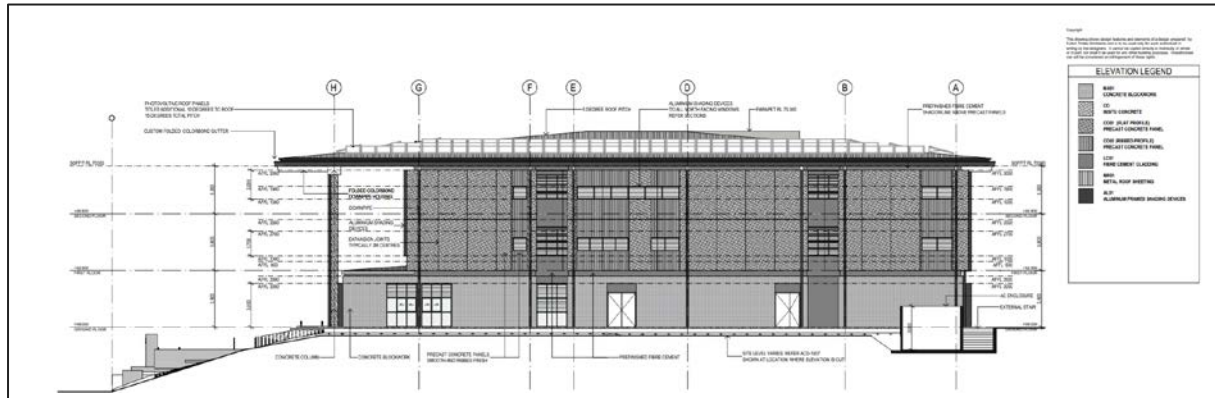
| Northern elevation (Source: Applicant's RtS 2021)
